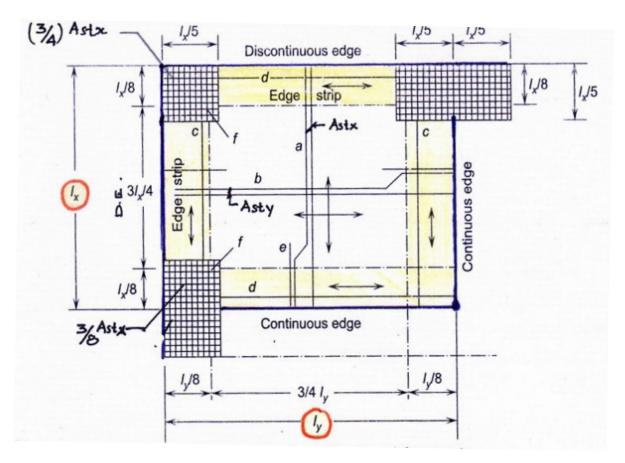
Reinforcement details and strips in Two way restrained slabs
